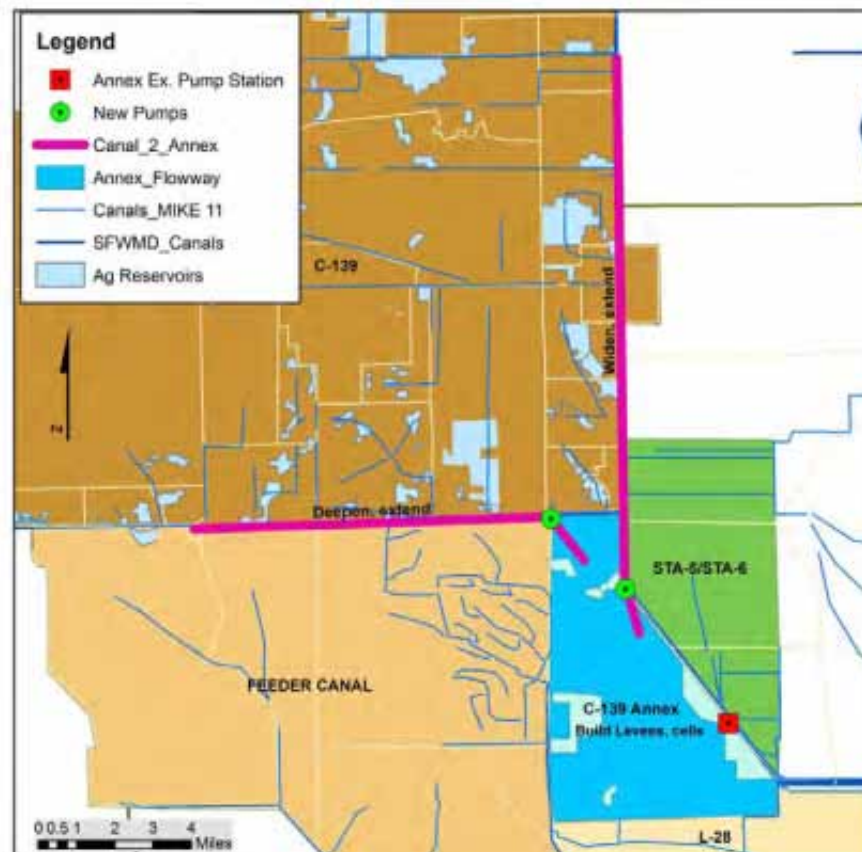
Conceptual Layout to Construct Storage and/or Treatment Facilities on C-139 Annex
